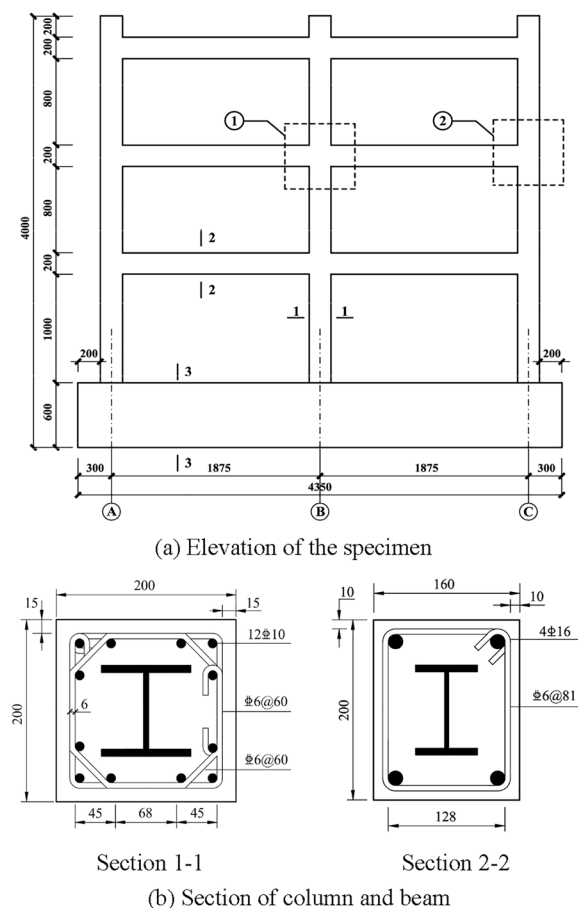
Dimension and steel layout of specimen (unit: mm)
